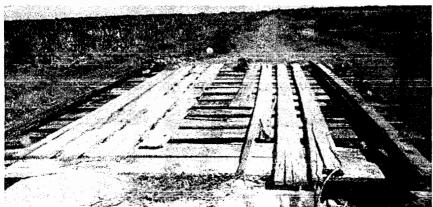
Showing Cath 16 High Bridge with deck and Track damaged
